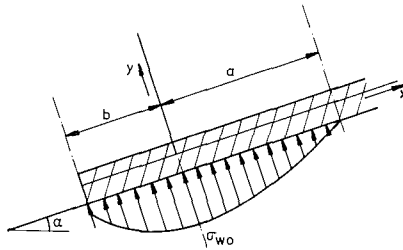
Hydraulic uplift pressure under an impermeable asphalt revetment.
